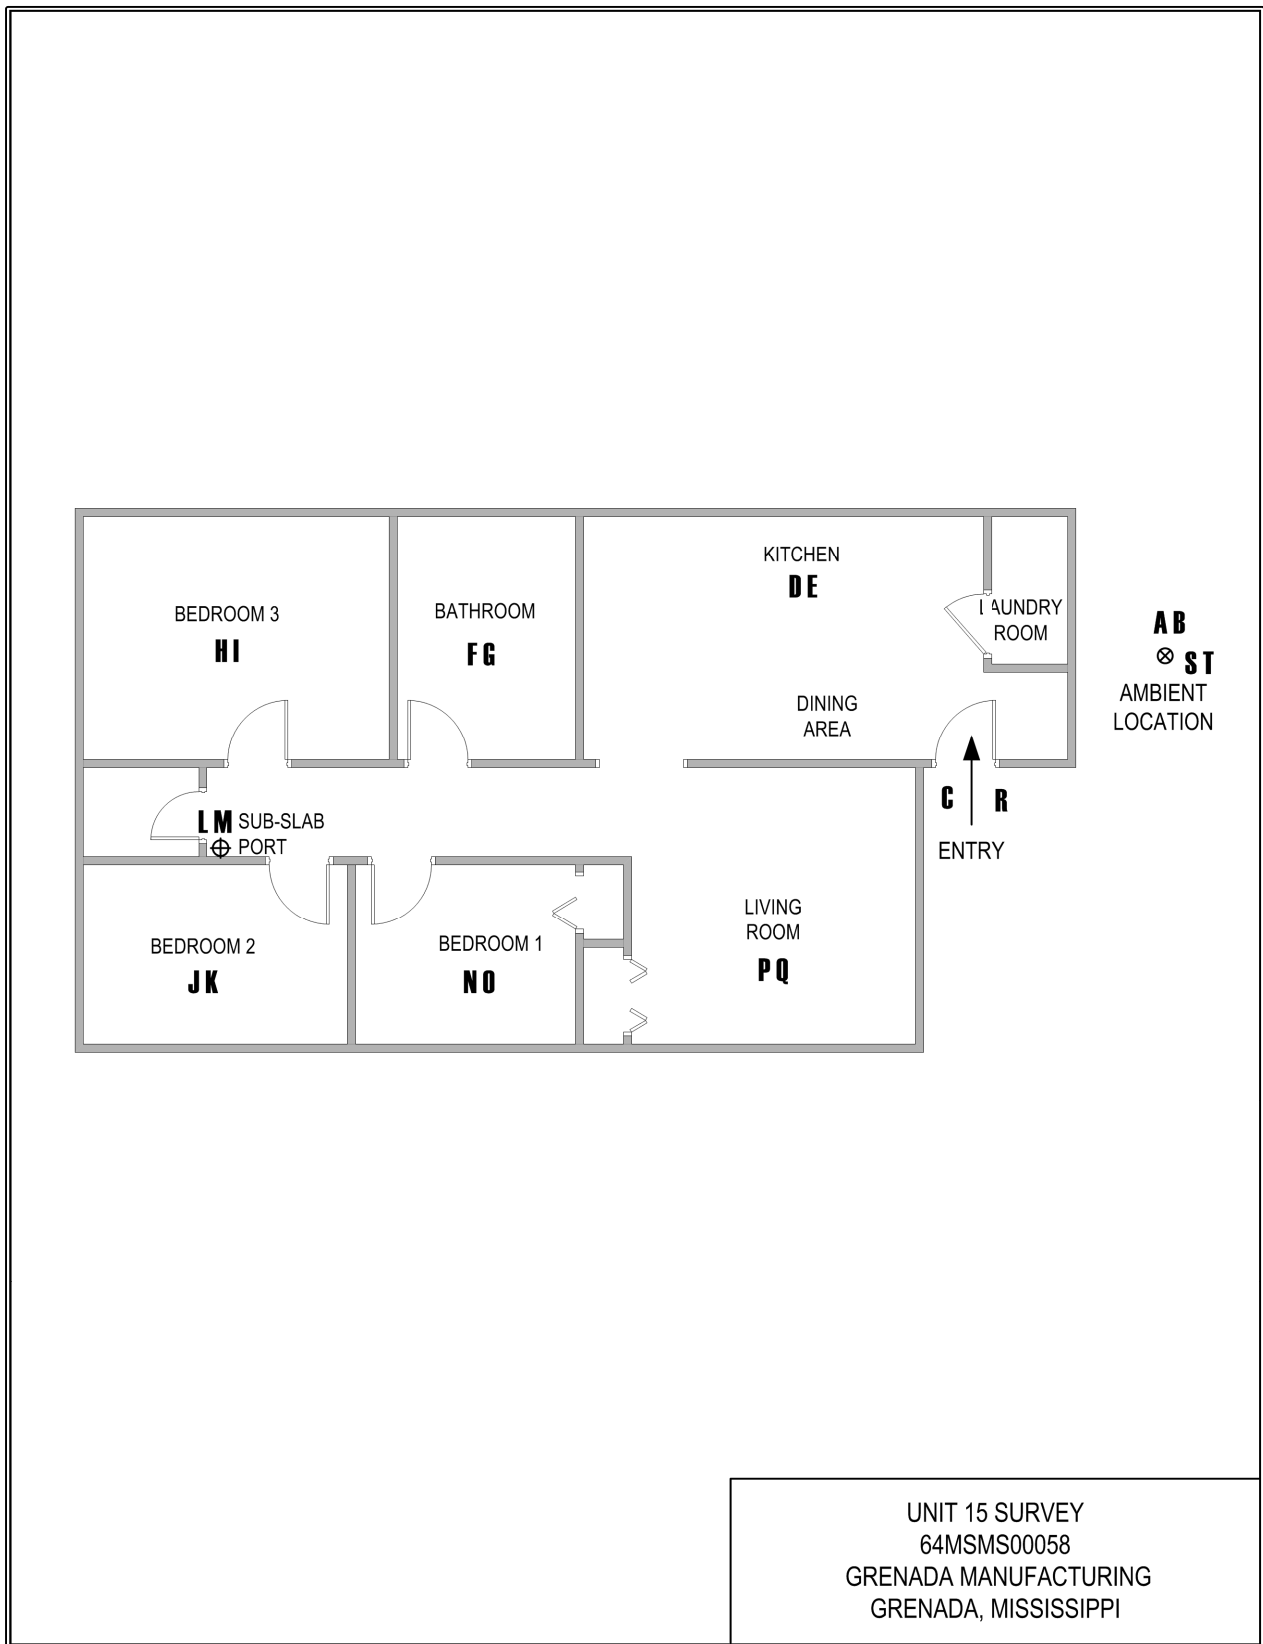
Unit 15 Survey Floor Plan, 64MSMS00058
